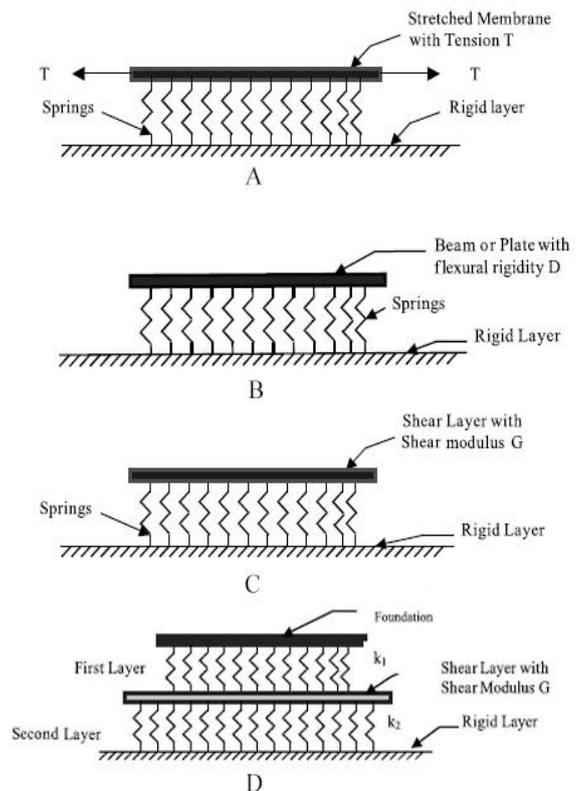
Improvements of Winkler model A. Filonenko-borodich foundation B. Hetenyi's foundation C. Pasternak foundation D. Kerr foundation [11]
